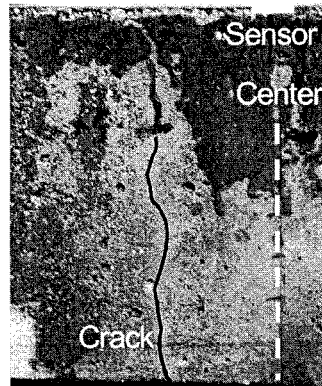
Initial crack of concrete beam specimen.
